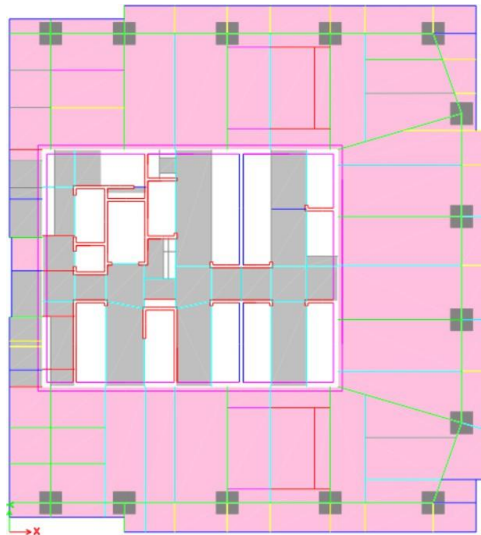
Typical Floor Plan for Floors 1-40 Models 1, 2, and 3
